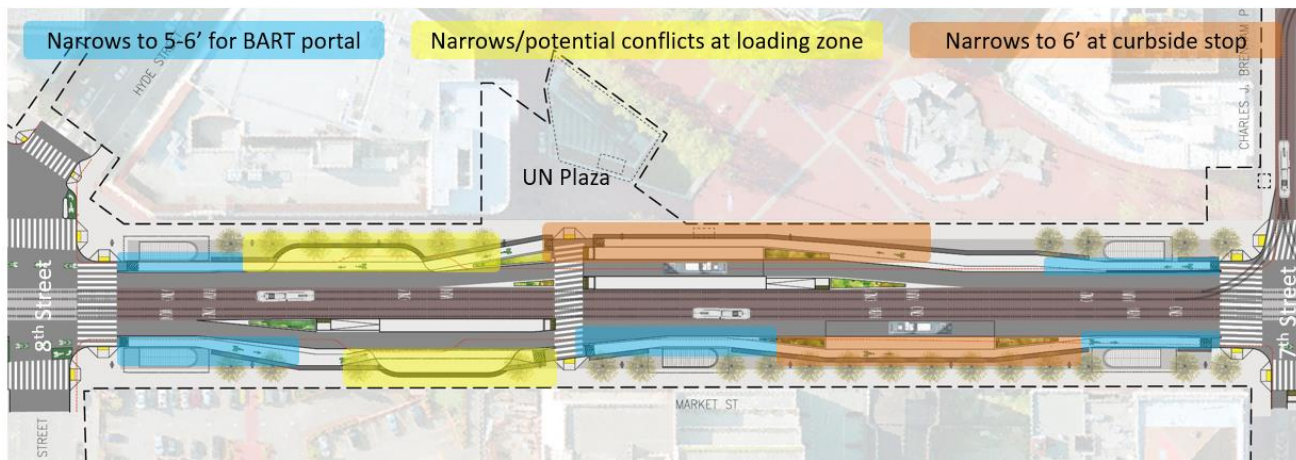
2019 Design plan view of Market Street between 7th and 8th streets highlighting where bikeway narrowed
